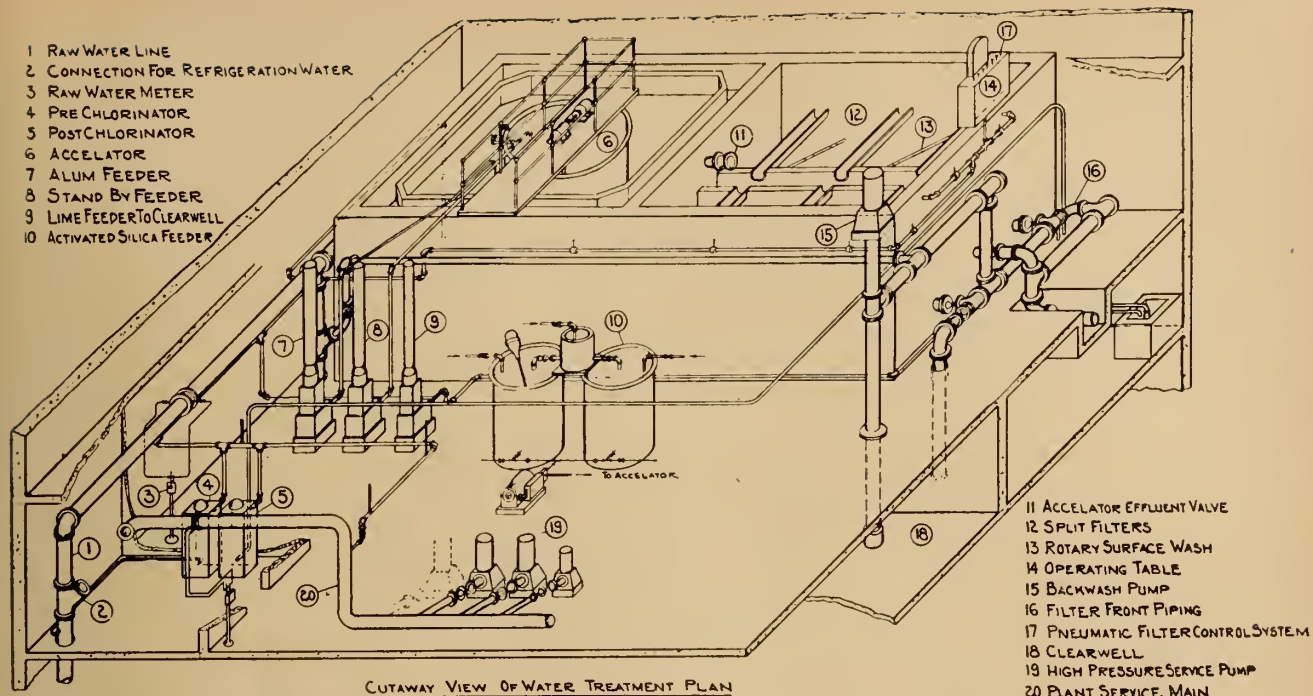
A sectional view of the water treatment plant at the brewery, showing layout of piping and equipment.
